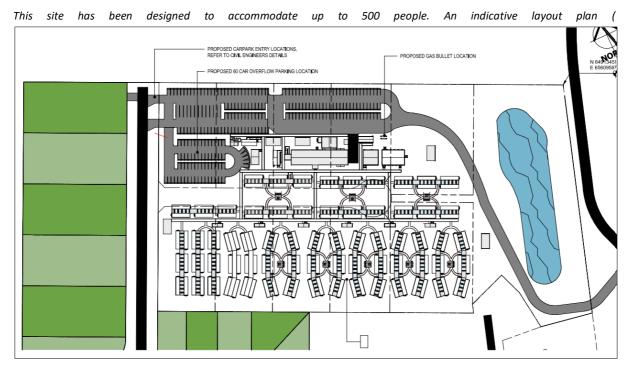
providing a total of 66-unit blocks have been arranged in a stacked formation across the site, with frontage to Marshall Street. The indicative layout plan has separate rooms for 524 people, allowing flexibility to enlarge selected rooms or increase the number of rooms for persons with disabilities (currently four rooms) depending upon requirements. This arrangement would be supported by the construction of 241 vehicle parking spaces, which includes disabled parking provisions, and 36 long/heavy vehicle parking spaces.
